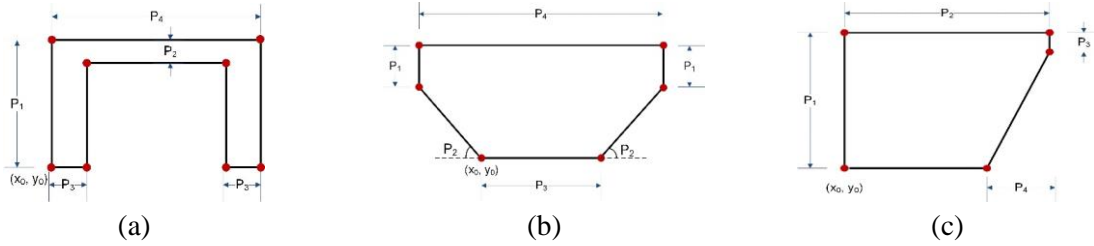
Parametric profiles: (a) Wing walls; (b) Deck; (c) Abutment
